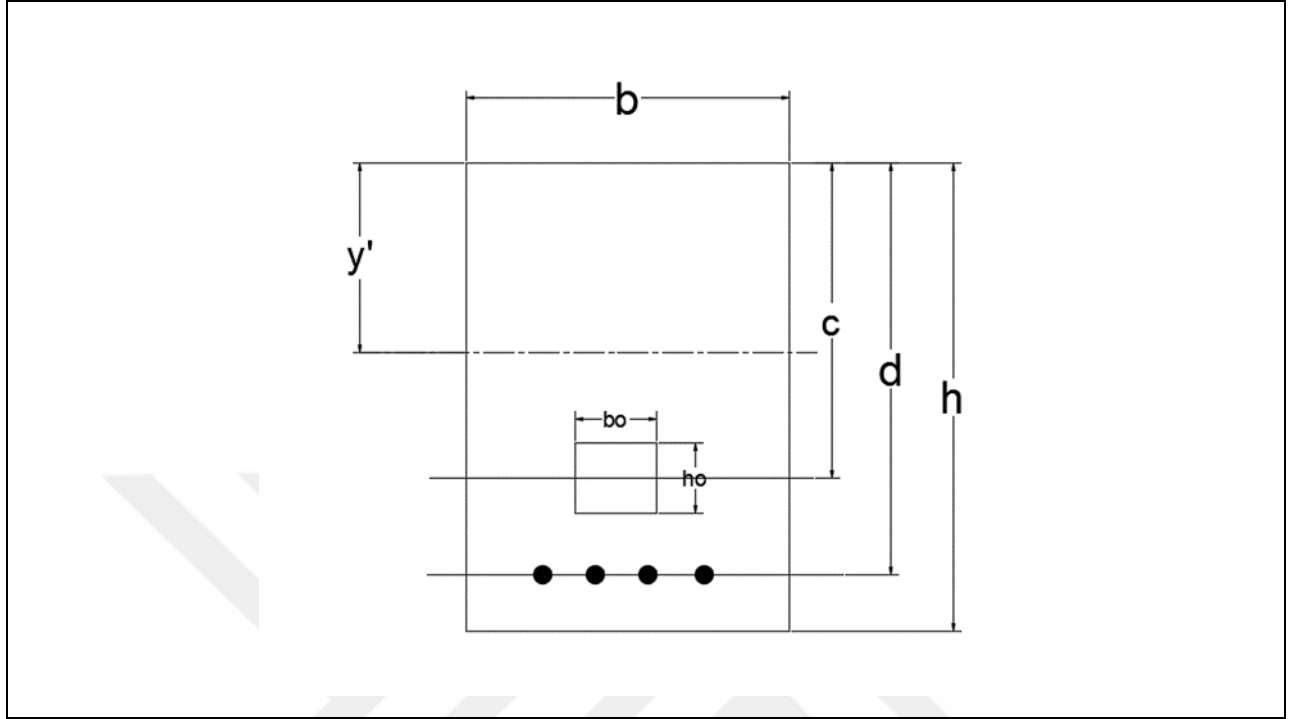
Assigning of The Neutral Axis And The Effective Depth For The Opening In Uncracked Reinforced Concrete Beam With Rectangular Opening In Tension Zone
